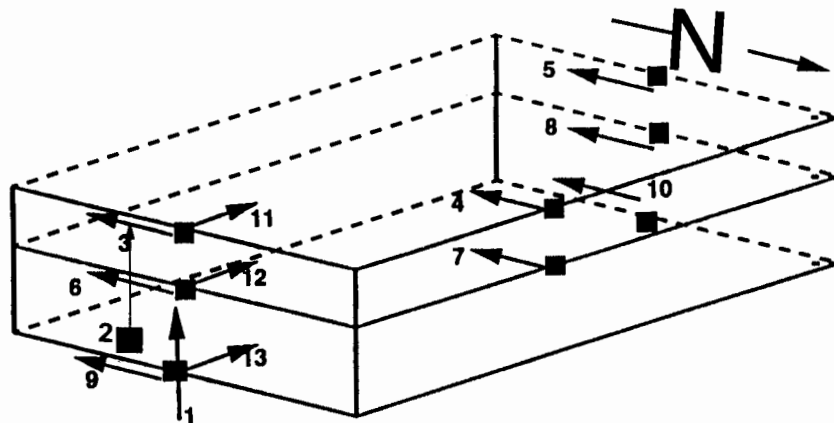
Milpitas Two-Story Industrial Building Building Instrument Layout
